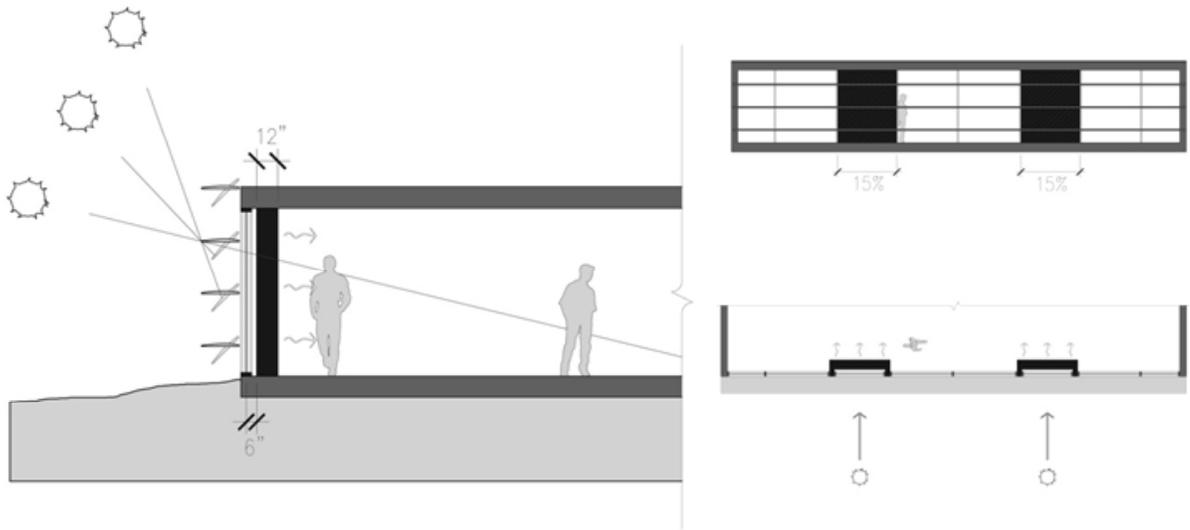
Illustrations of optimum trombe application (correct louvers, cavity spacing, trombe width and a 30% trombe/70% glazing elevation and plan)
